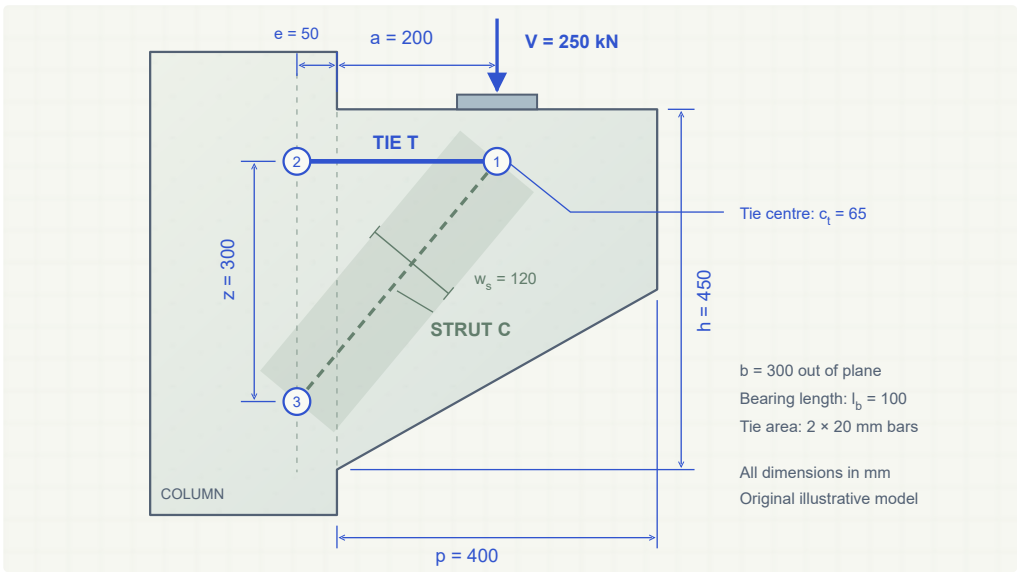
Original side elevation and assumed local load path for CB-01. The line model identifies node centres; it does not detail concrete nodal zones or reinforcement anchorage. Dimensions govern the sketch.
